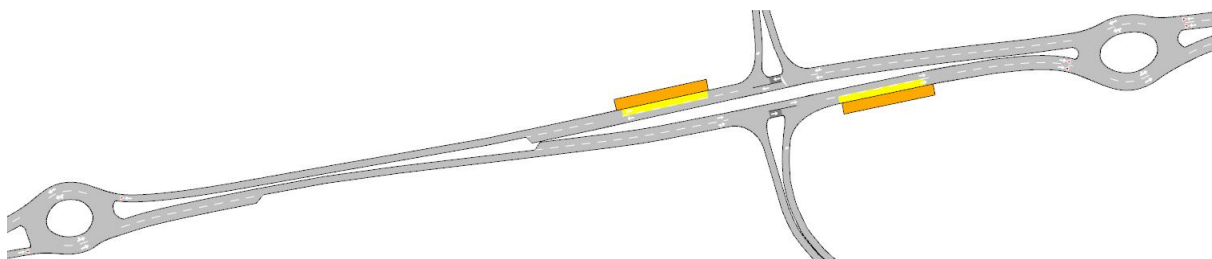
Concept 3 - Turnabouts as a road stretch solution
